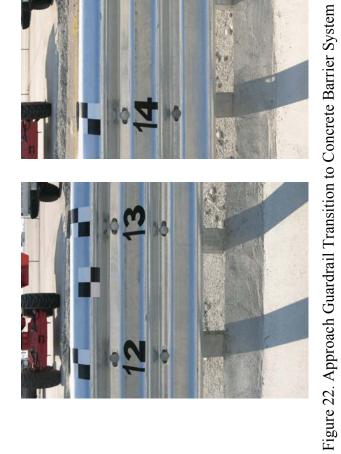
Approach Guardrail Transition to Concrete Barrier System
